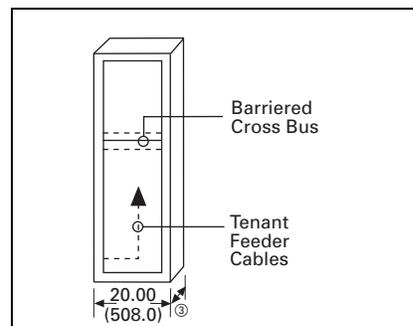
Load Side Pull Section with Barried Cross Bus
